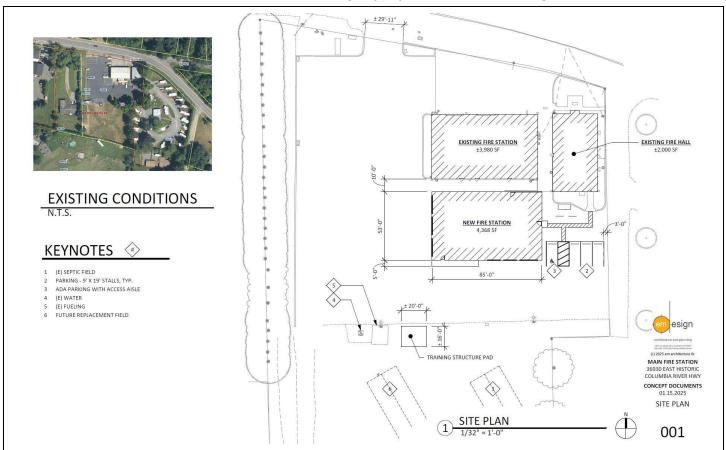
Plan drawing for proposed new construction and the Corbett Fire District #62 Station upgrades, courtesy of EM Architecture LLC.
